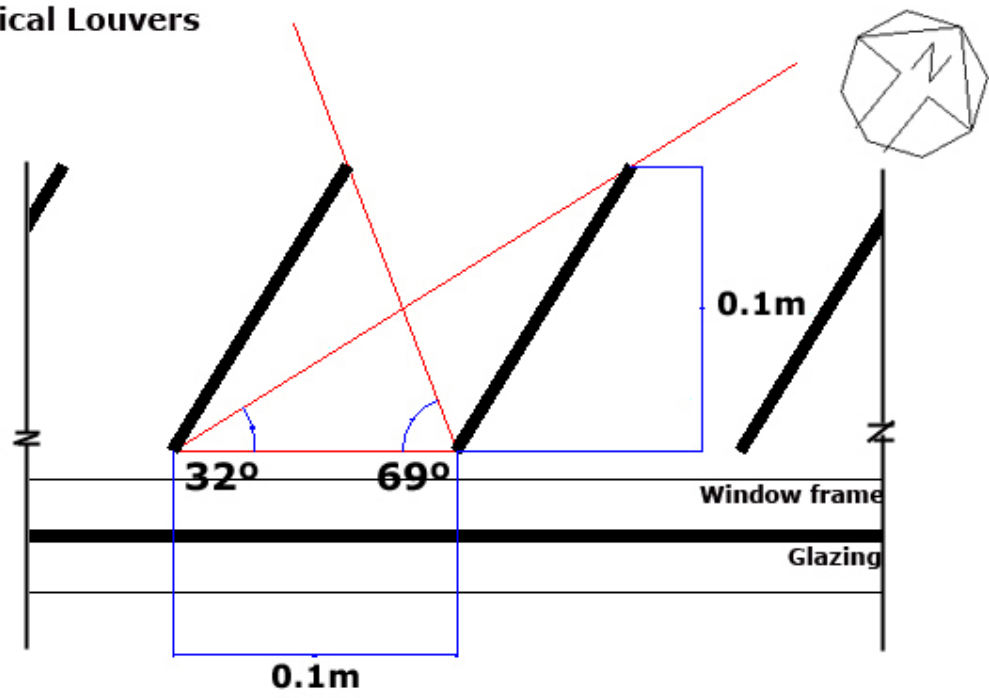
Dimension of shadings for northwest facing opening in Building 3
